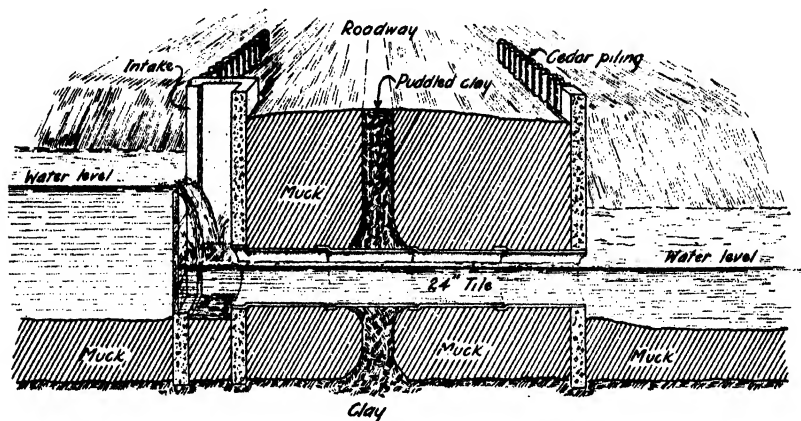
A drawing which shows a cross section of muck dam with clay core wall. Concrete intake has removable gate sections of plank for controlling the water level on the upper side of dam. Water is conveyed from the intake through the dam by means of 24-in. tile.
